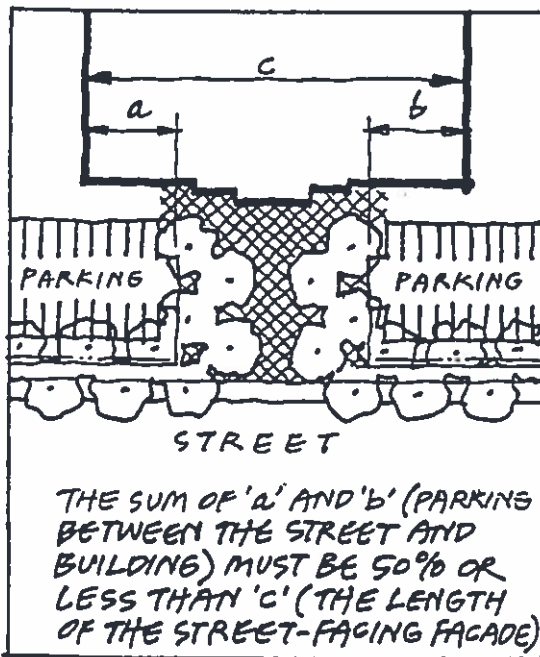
B ONE EXAMPLE OF THE LIMITATION OF PARKING BETWEEN THE BUILDING AND THE STREET
